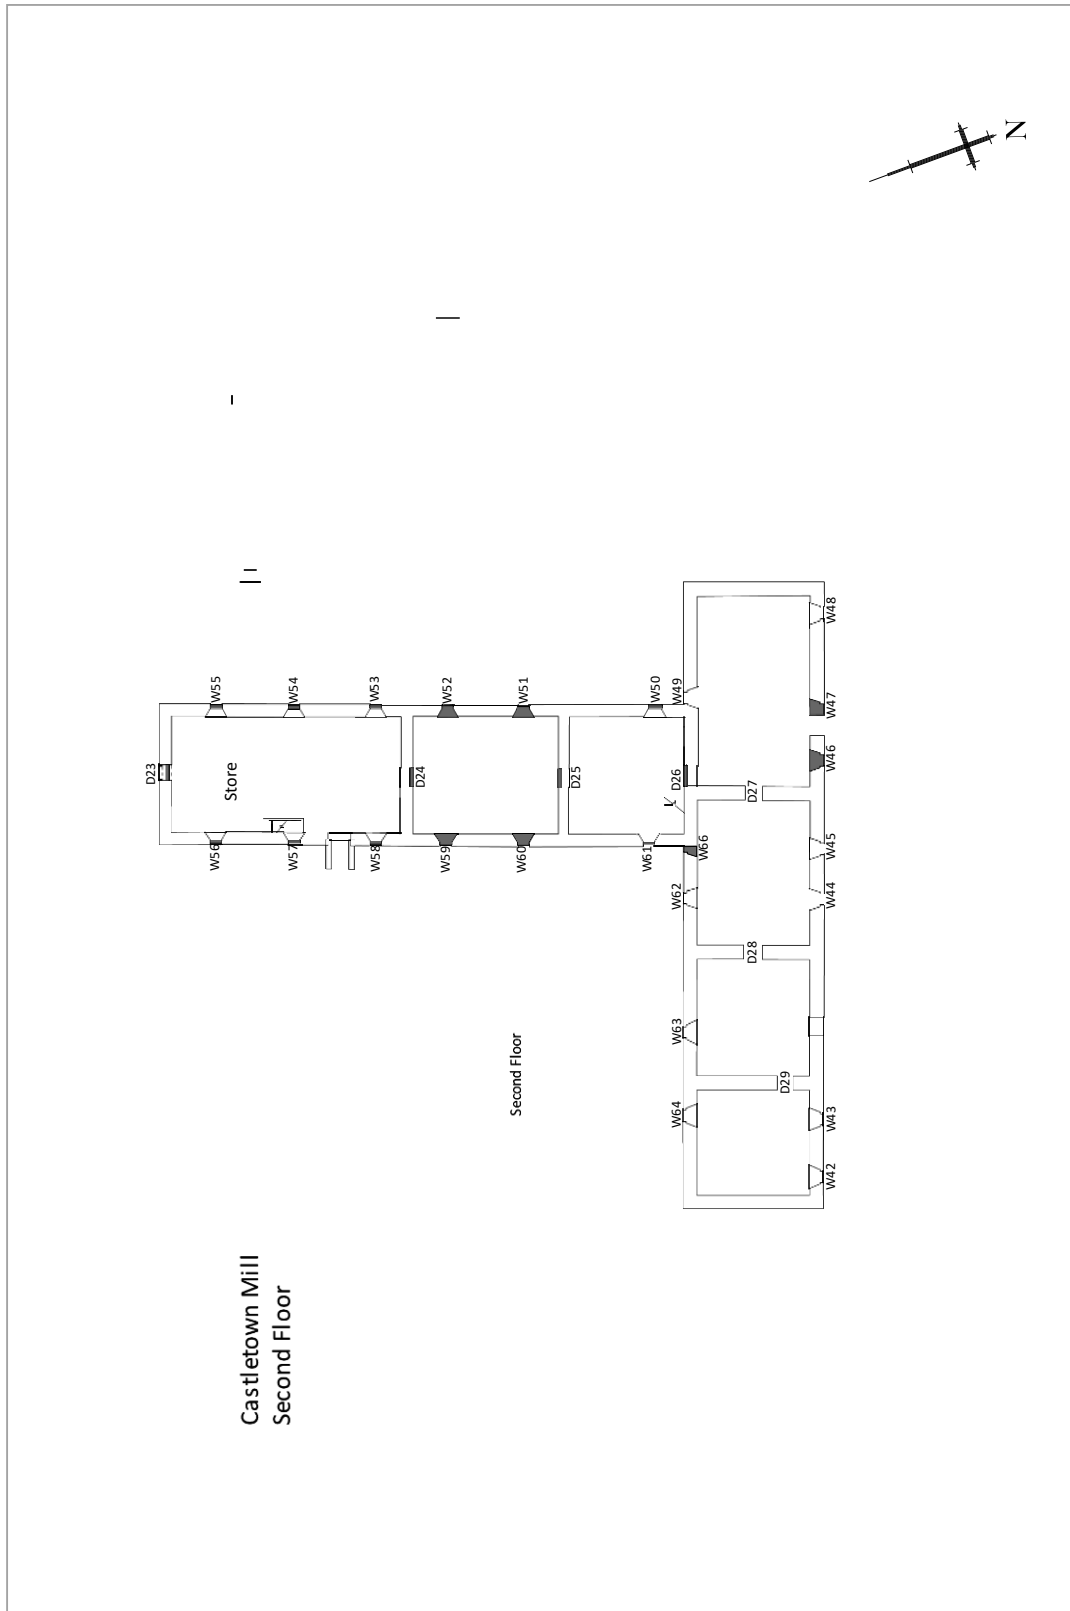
Second Floor Room Plan of Castletown Mill (Including doors and windows)
